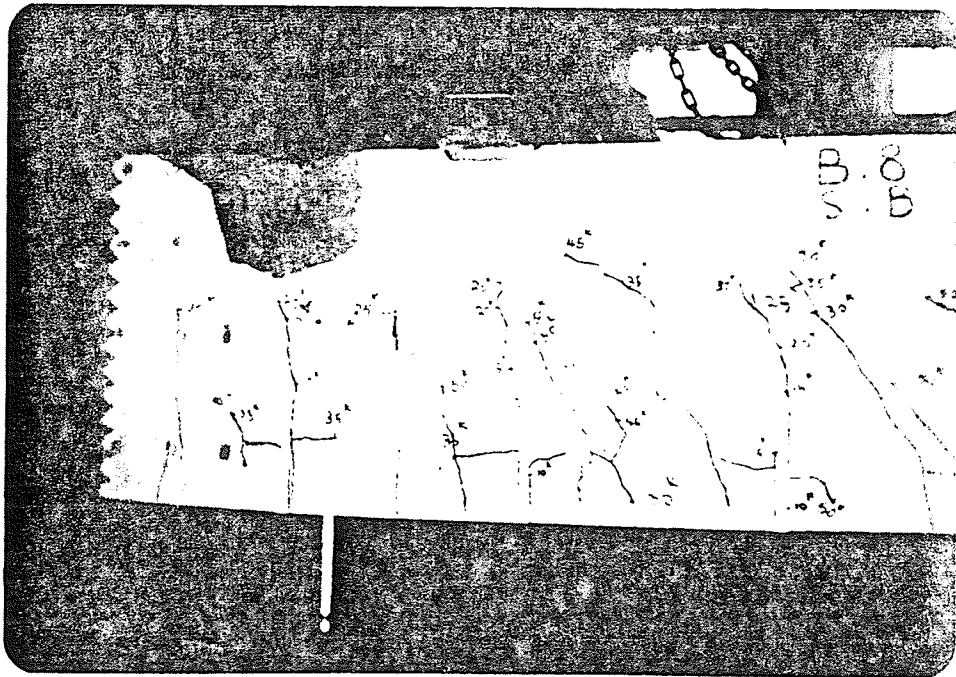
Cracking and final flexural failure of Beam #8 (Side B).
